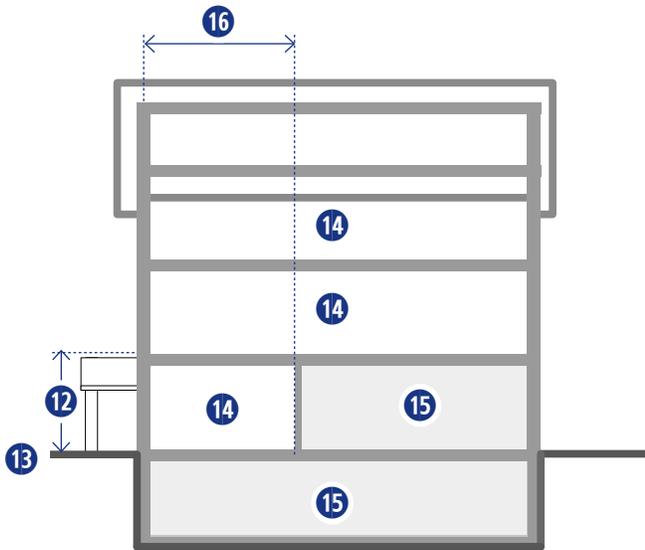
Detached House Building: Floor-to-Floor Height & Use Requirements
